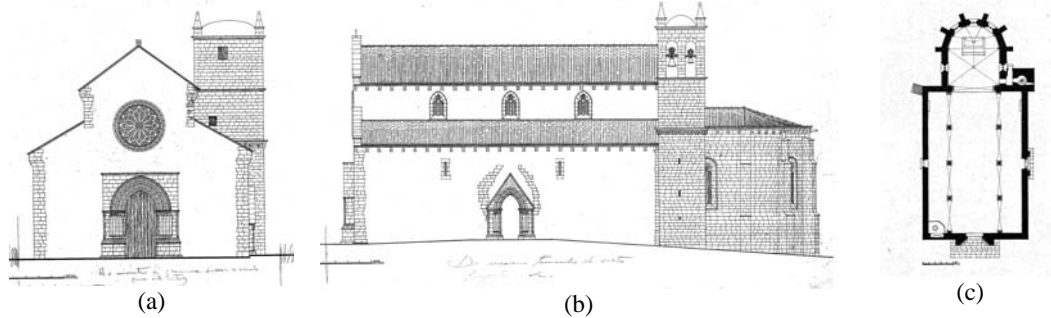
Geometry: (a) main façade; (b) south lateral façade; (c) plan
